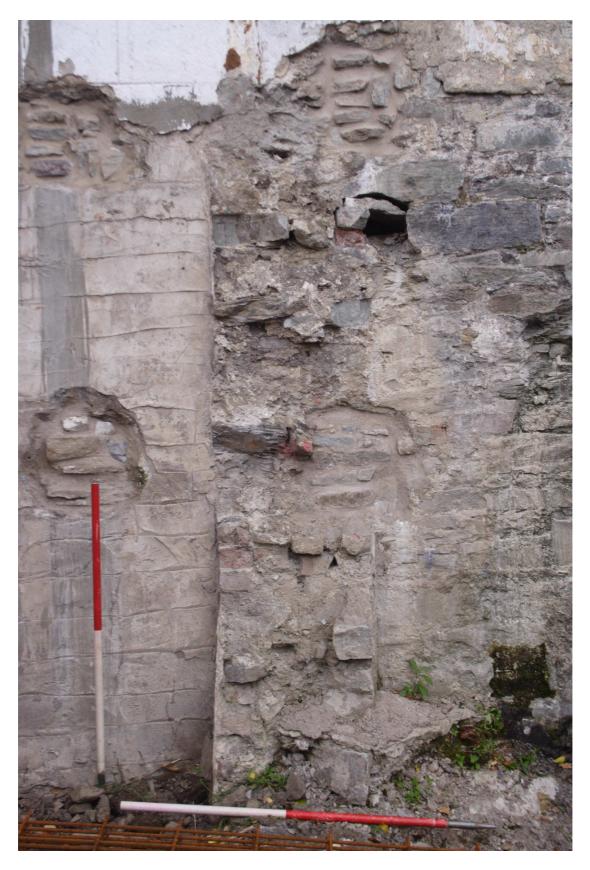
Lower section of retaining wall. Former cottage wall to centre. Concrete render to left. Pinning scar visible above vertical scale, shot 10.
